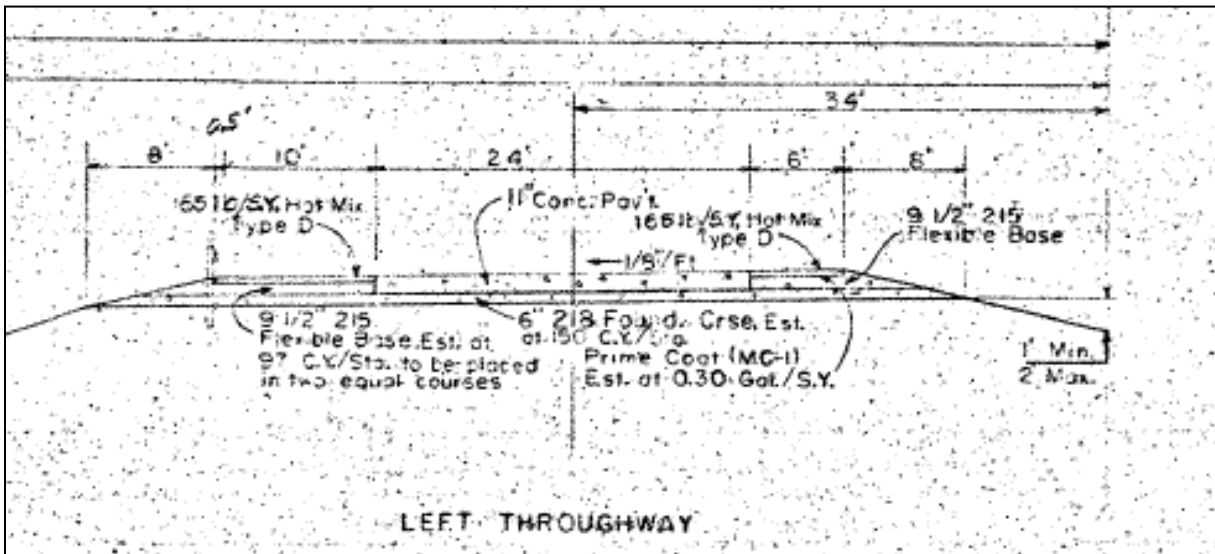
1957 Typical Section—Left Throughway from SH 30 to North of SH 75.
